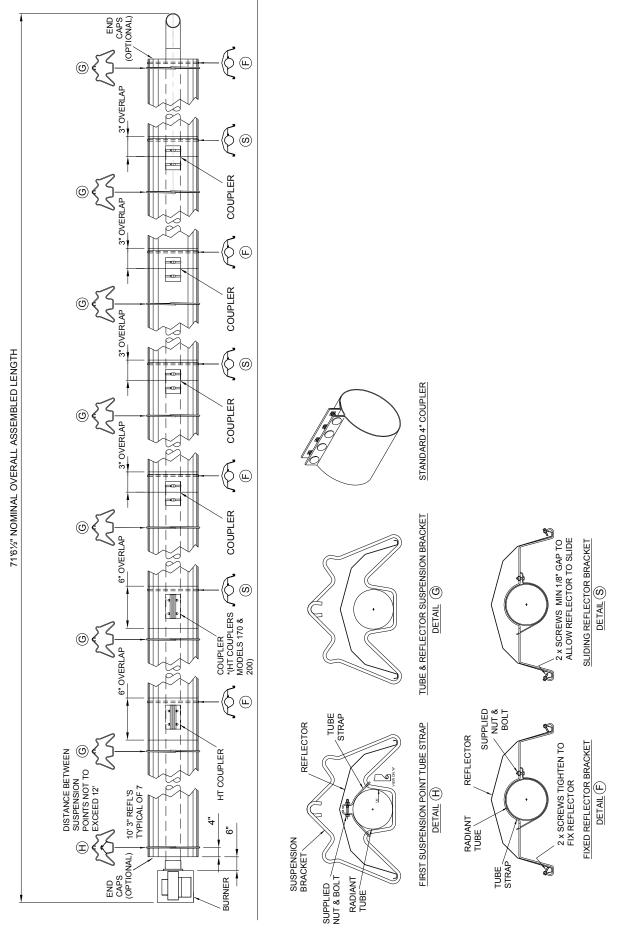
Heater Assembly: Model Linear 170-S80 and 200-S80
